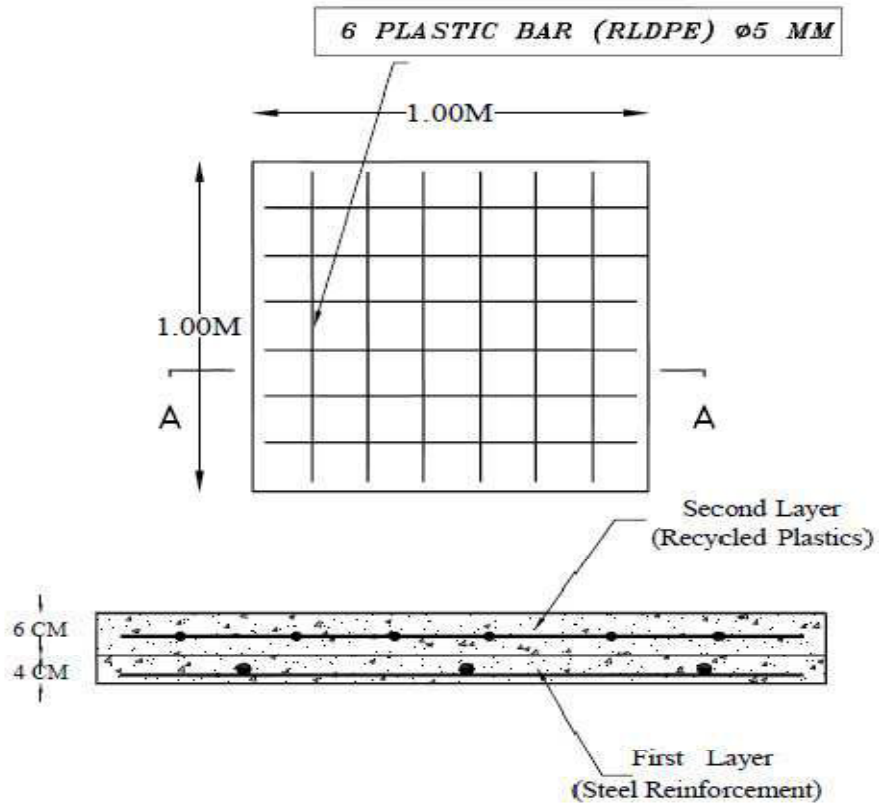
0.2% RLDPE fibers as secondary reinforcement.
